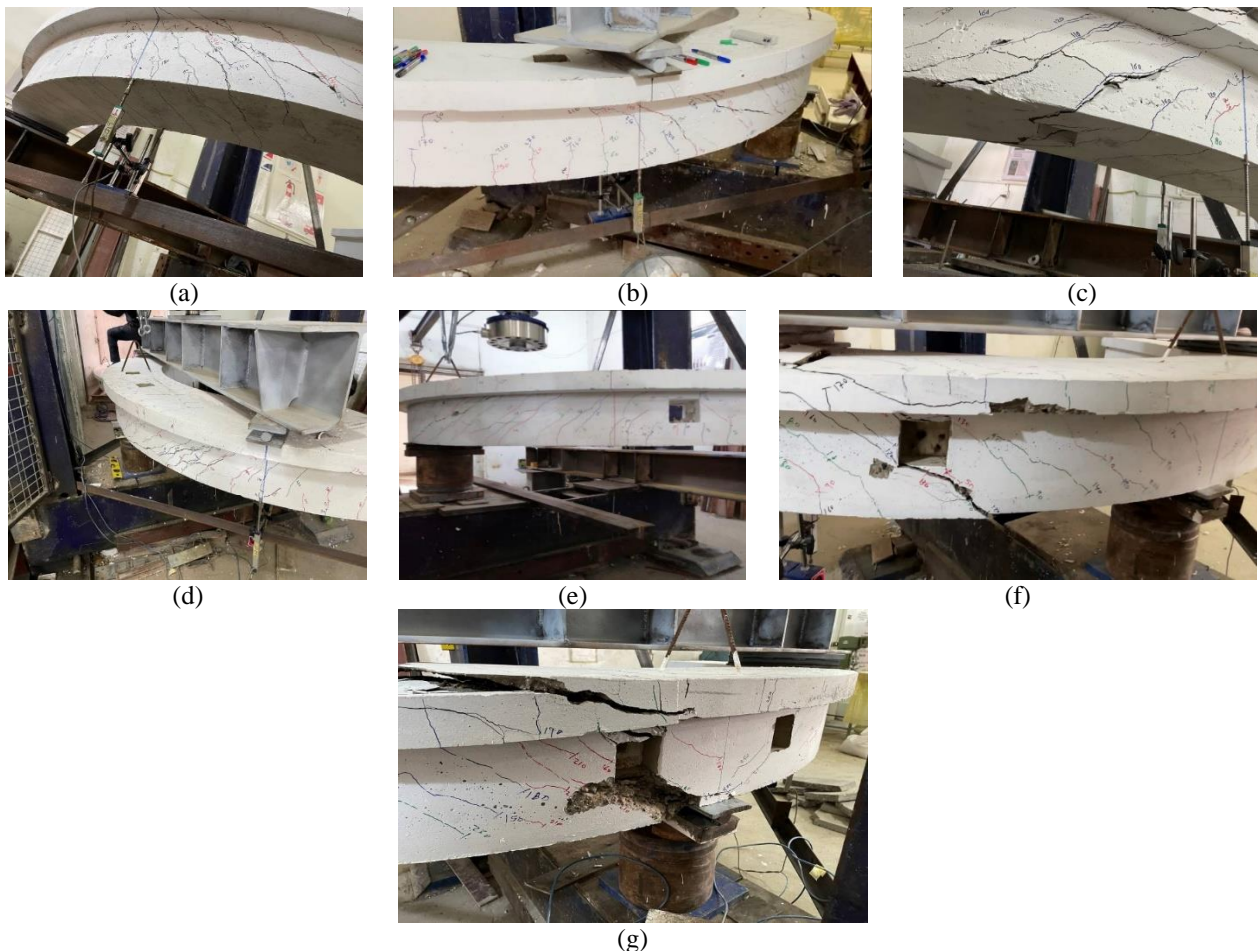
Specimens after failure: (a-g) specimens CB1- CB7.T82
